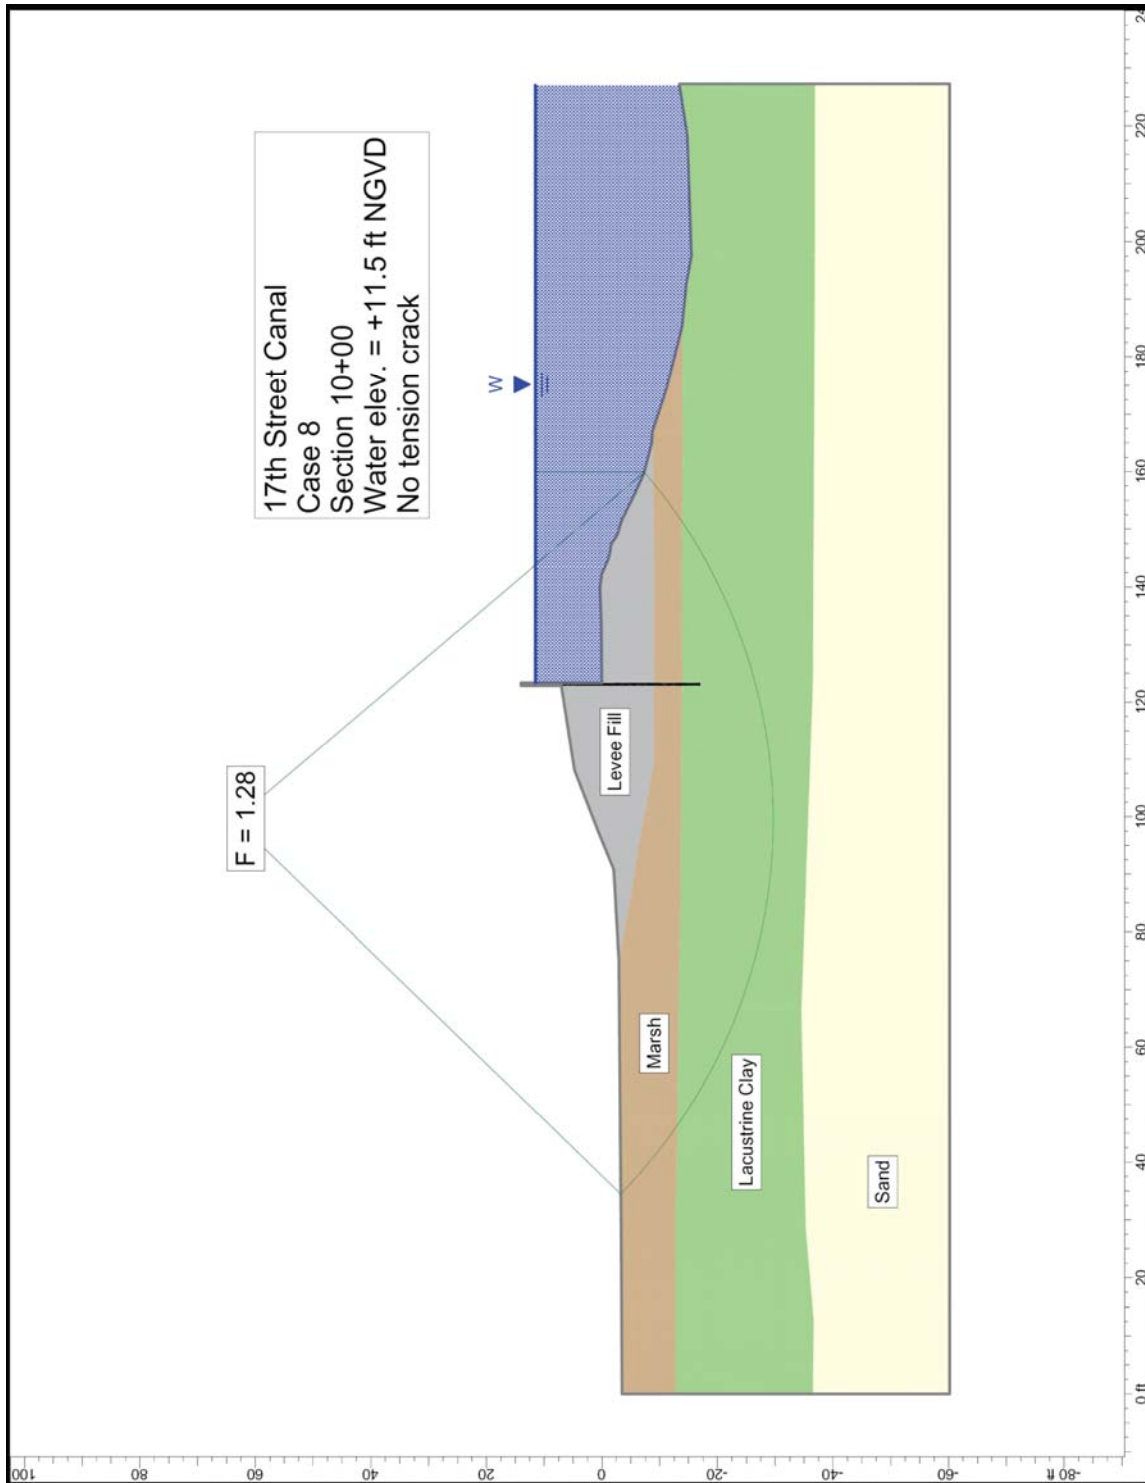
Critical circle for 17th Street Canal Station 10+00 – water elevation 11.5 ft, no tension crack.
